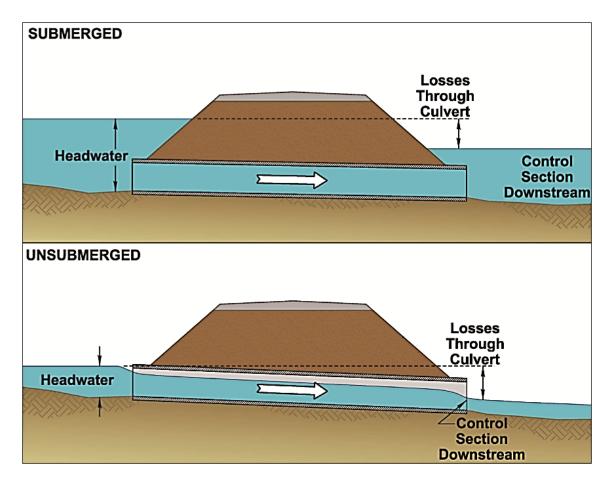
Typical Outlet Control Flow Conditions (Schall et al. 2012)
